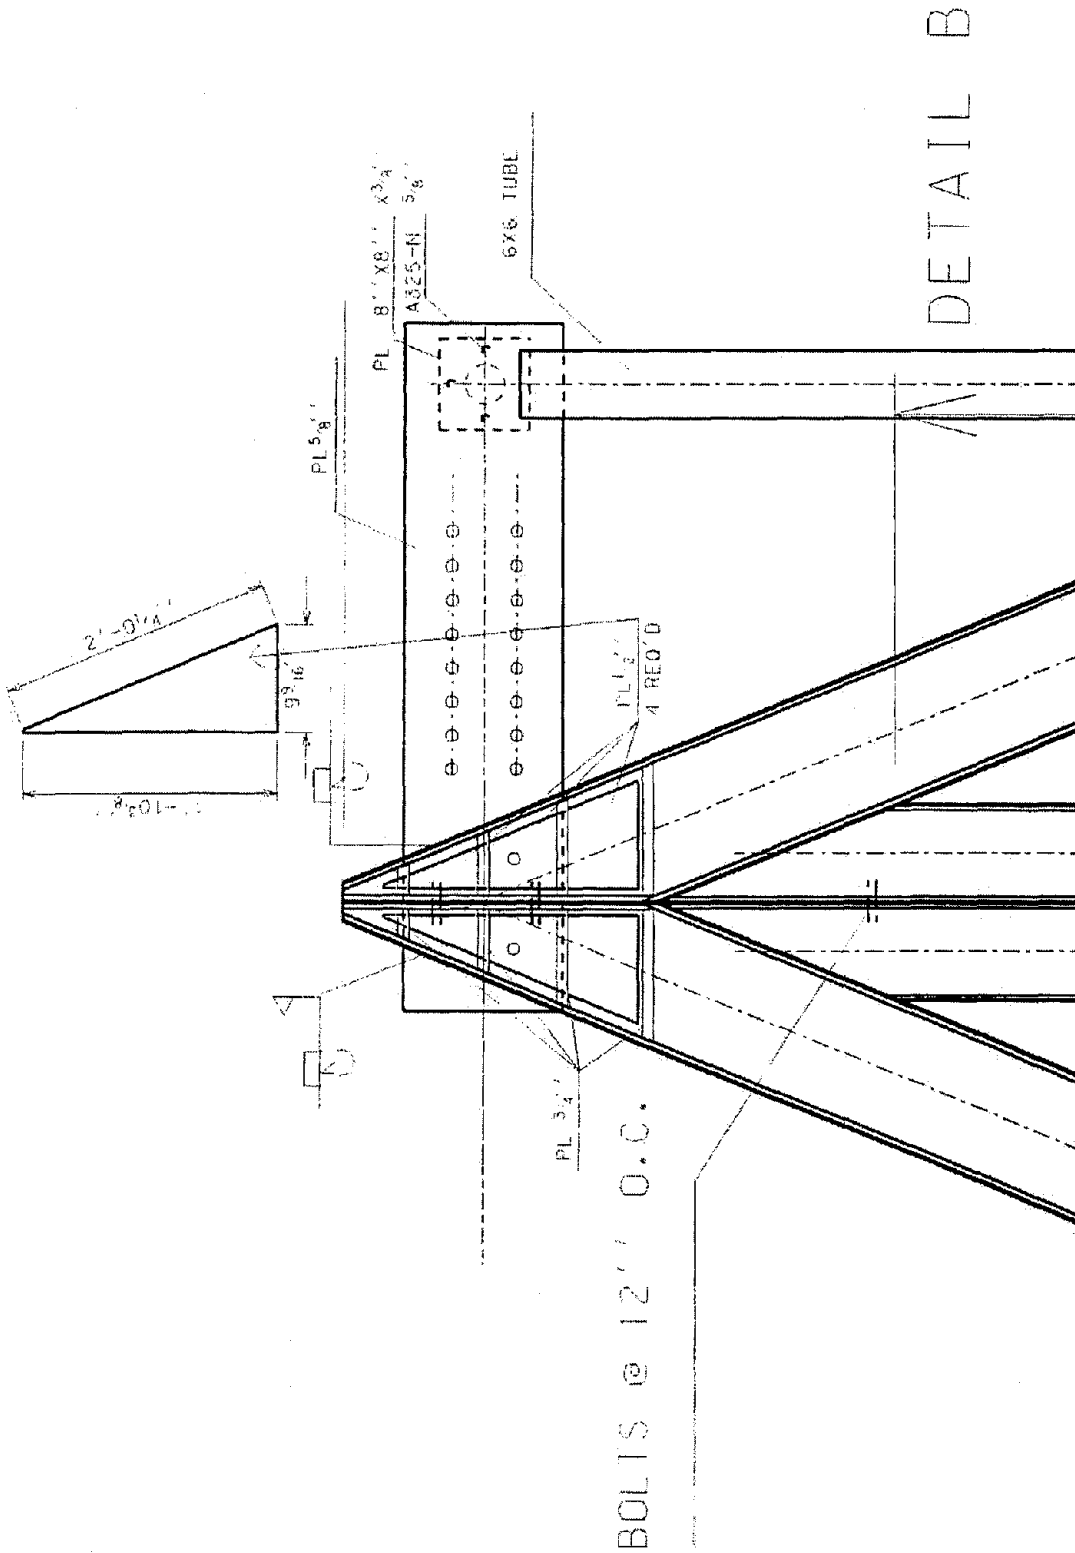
Construction drawing of load frame: Detail "B" (1'=305 mm, 1/2"=25.4 mm)
